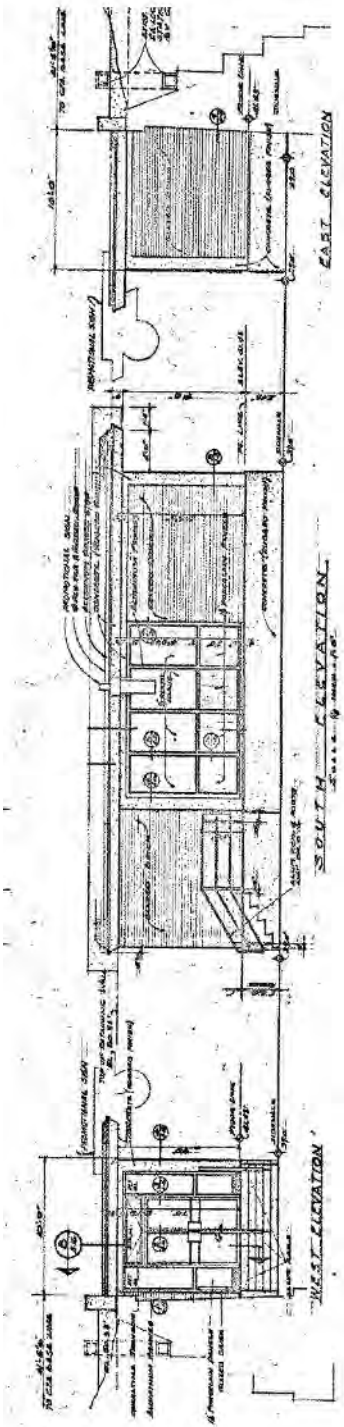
Excerpt from historical drawings of the Austin Stationhouse exterior elevations, 1961. Courtesy of the CTA.
